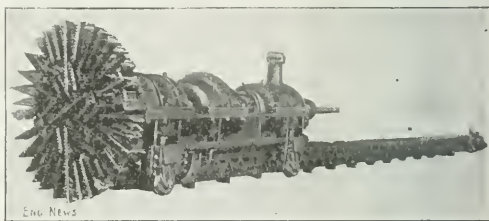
KARN'S TUNNELING MACHINE WITH DRILL HEAD MEASURING 6 FT. IN DIAMETER
